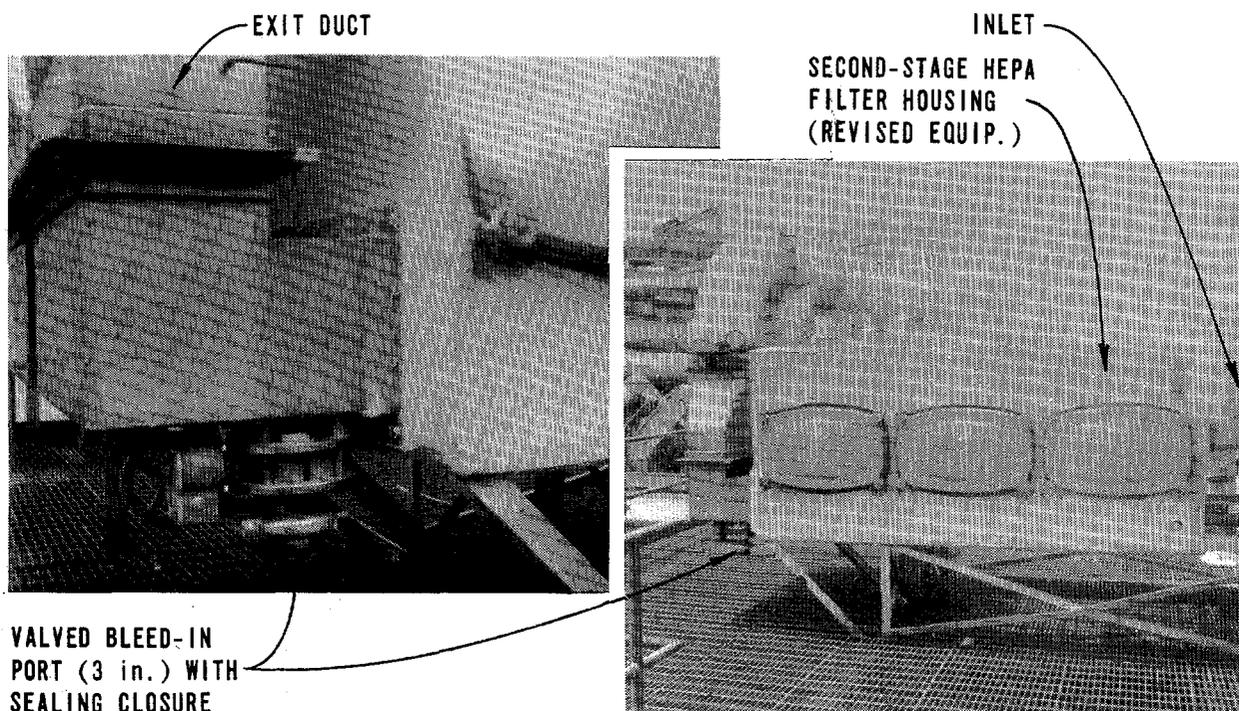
Valved Bleed-In Port at Second-Stage HEPA Filter Housing.
